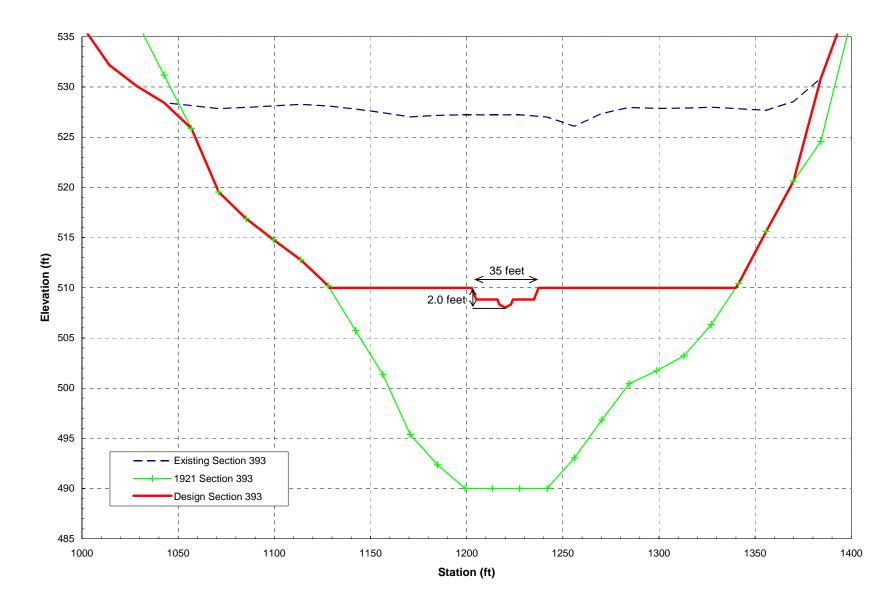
Typical cross section and design channel geometry for the reconstructed reach of the San Clemente Creek Branch under the Notching Alternative.
